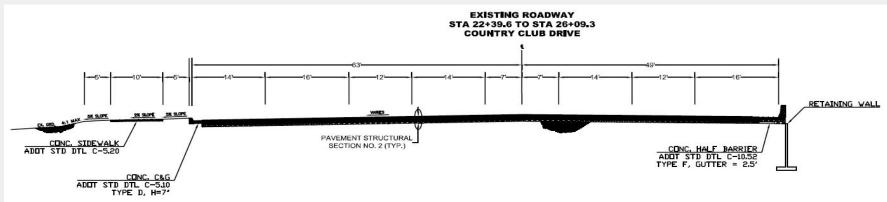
Country Club Drive Existing Cross-Section (NTS)
